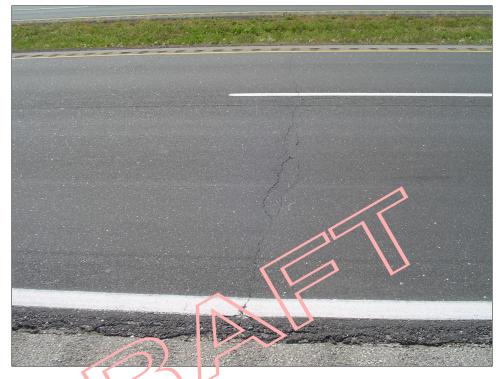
Highway 40' westbound lanes between North Talbot Road and Huron Church Line. Typical transverse crack.
